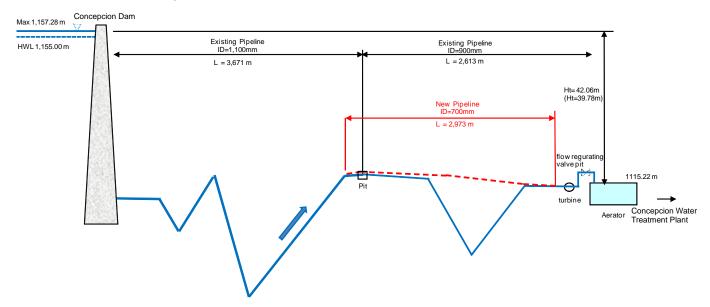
Outline Layout of Concepcion Hydroelectric Power Plant
